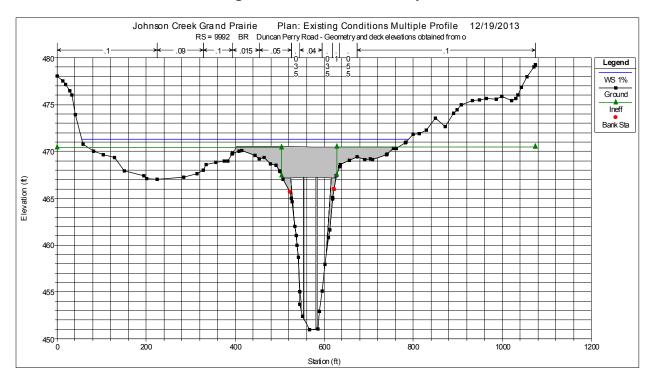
shows the concept of the Duncan Perry Road alternative with the existing and proposed cross section view of the bridge. Figure VII-3 shows a plan view of the Duncan Perry Road alternative with a conceptual plan with grading areas.
